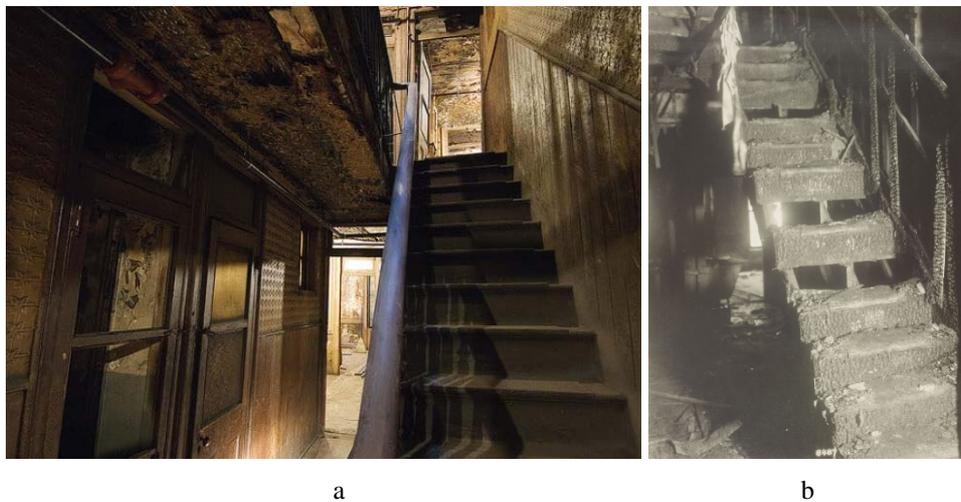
(a) Historical tenement apartment interior staircase from the New York Tenement Museum (URL-2), and (b) Condition of keeping staircases clean according to the 1867 law (a photo of a residential interior staircase that does not meet the criteria after a fire), (Marques, 2019)
